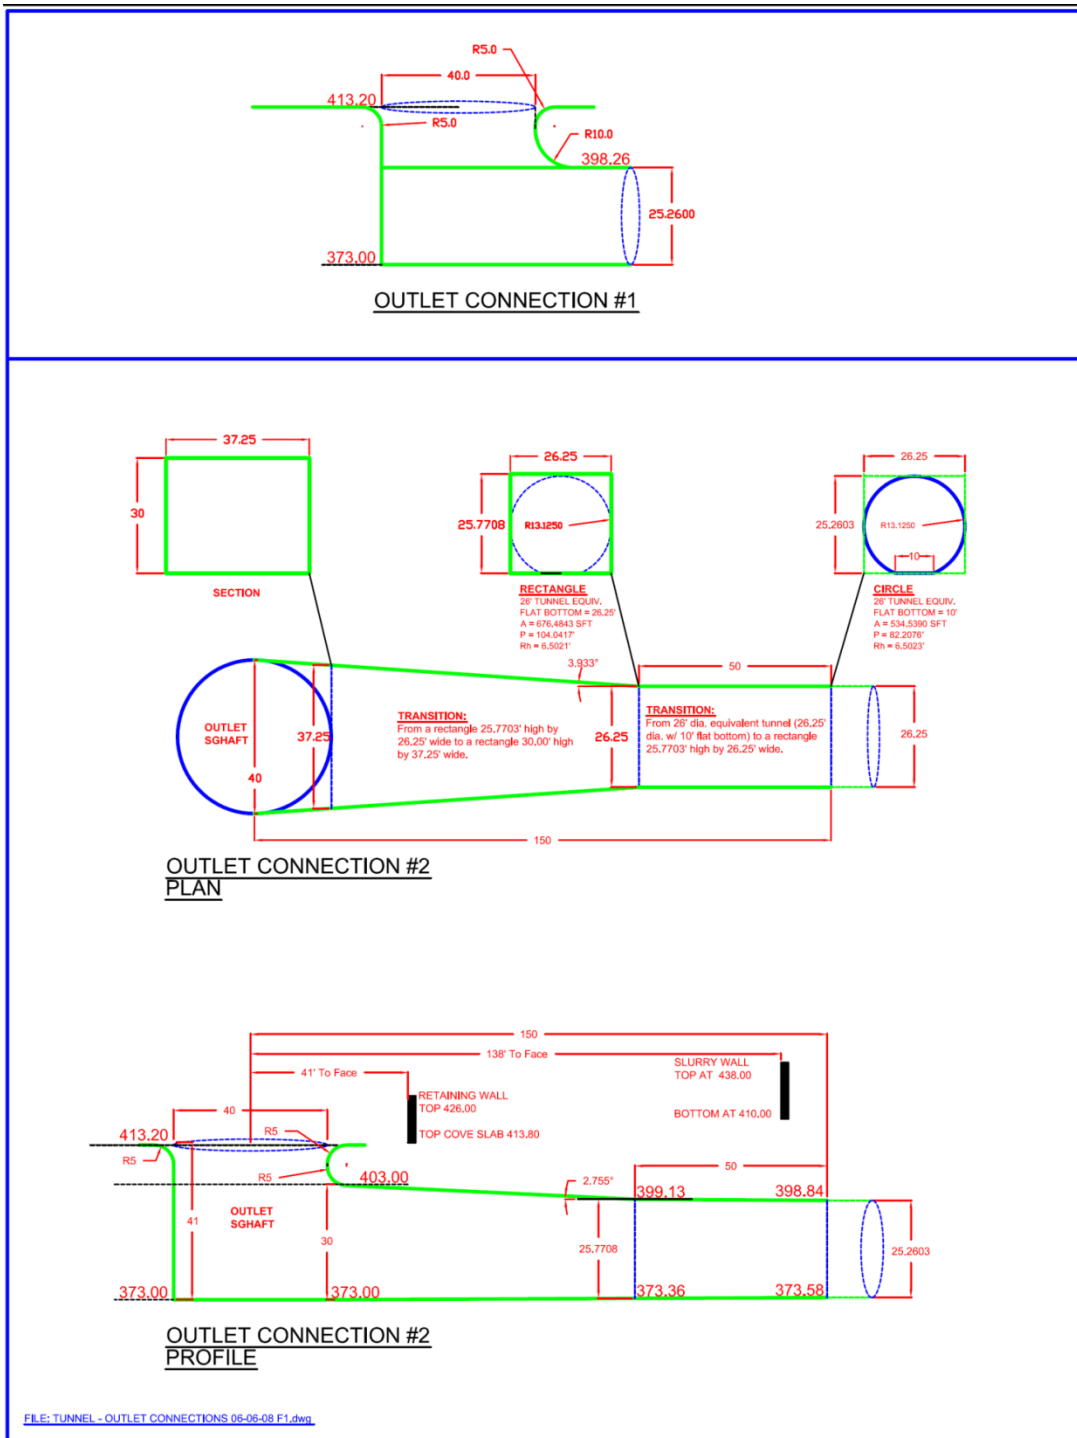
Waller Creek Tunnel Project; Outlet Connection Alternatives
